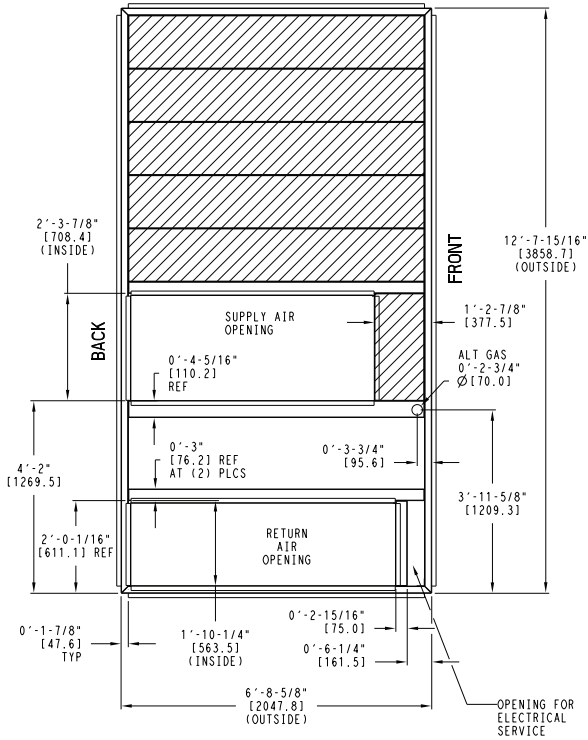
Roof Curb Details – 21 and 25 Size Units
